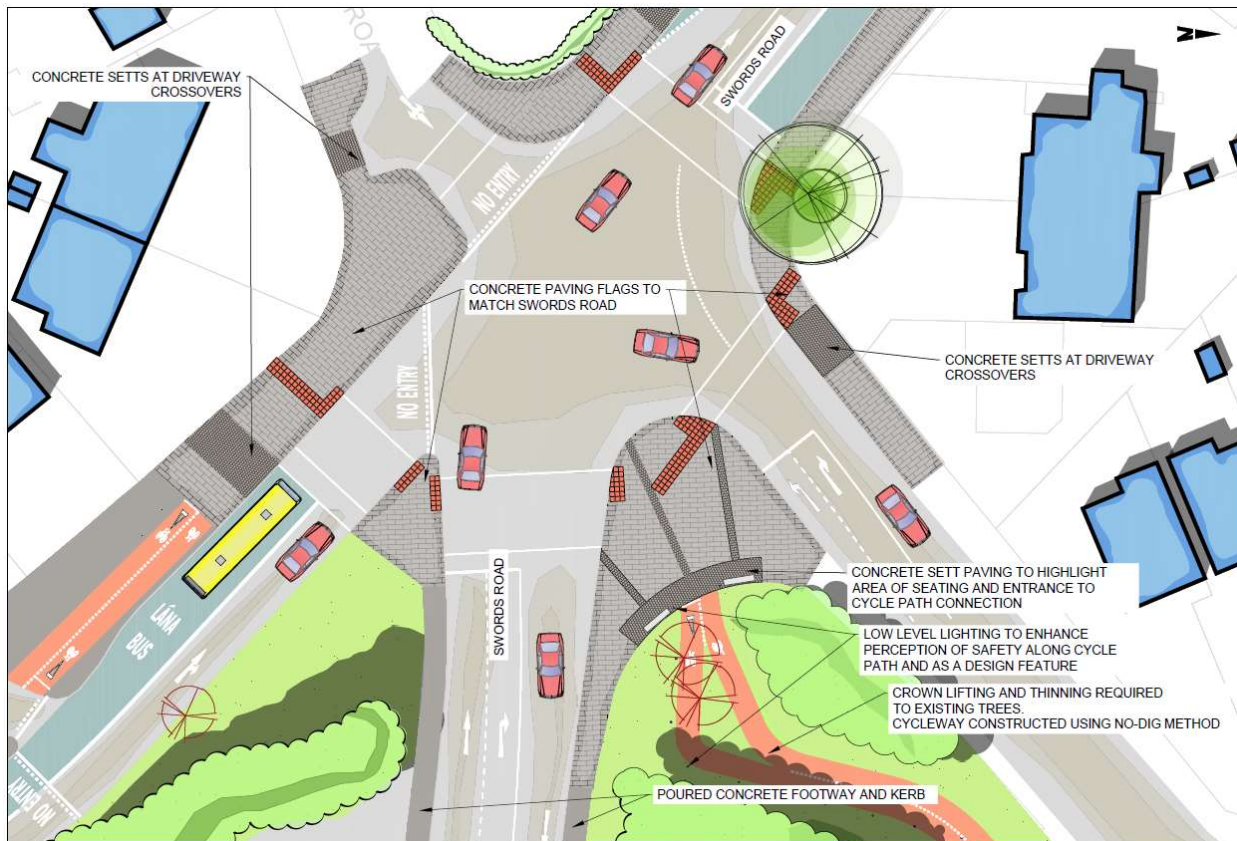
Eastern Corner of the Shanrath Road-Larkhill Road Junction Design
